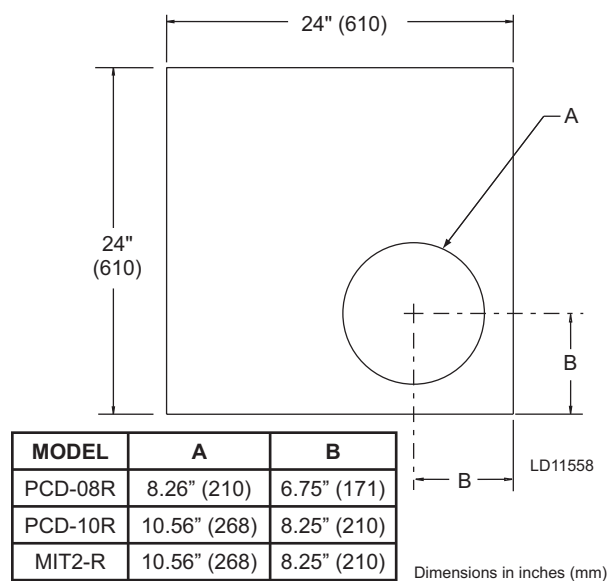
FLOOR PANEL OPENING FOR ROUND GRILLES
